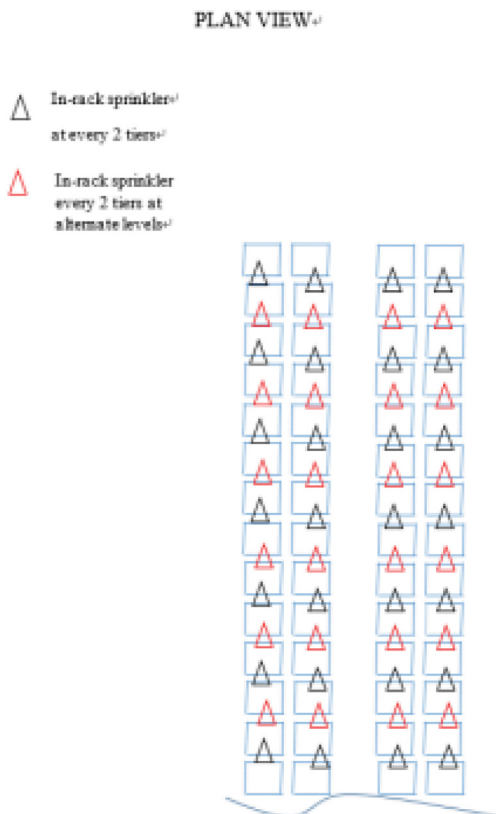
Plan view of in-rack sprinkler layout based on EN12845.
